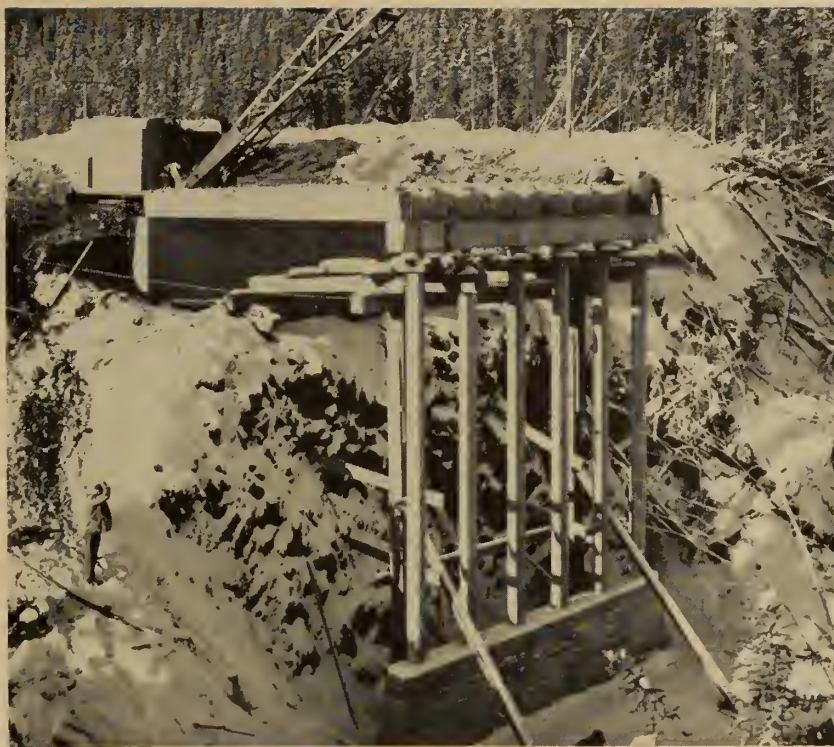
The first precast concrete bridge to be constructed on the Alaska Highway located at Mile 457; the precast members were made in Calgary.
